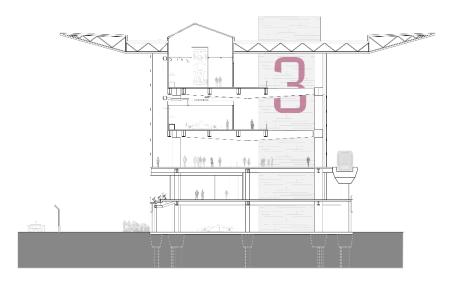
Building Section 1 (Source: Created By Author Nicholas DiBella)
